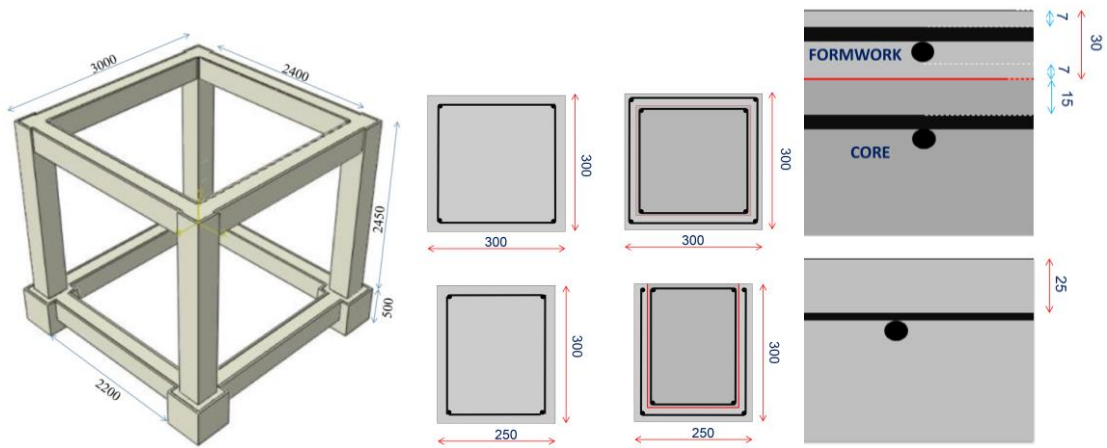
Finished dimensions of symmetric frames and cross sections in mm
